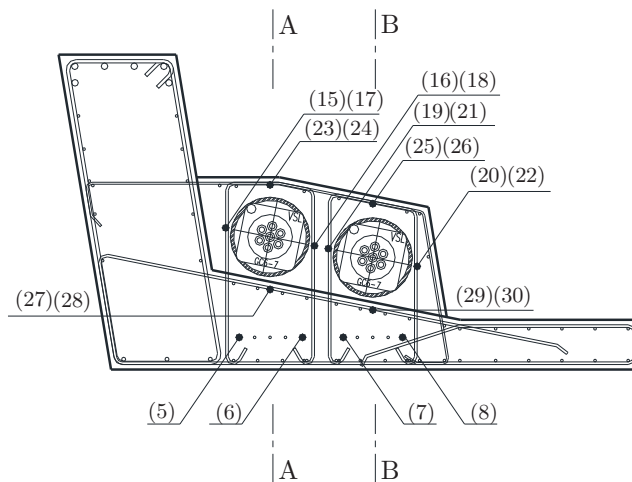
Strain gauges on the anchorage blister reinforcement (Section C-C)
